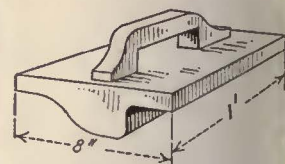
Grooving Tool for Use in Forming Flangeway in Concrete Paving
